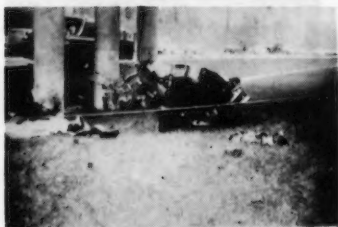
Disastrous Incident at Unprotected Median Bridge Pier
